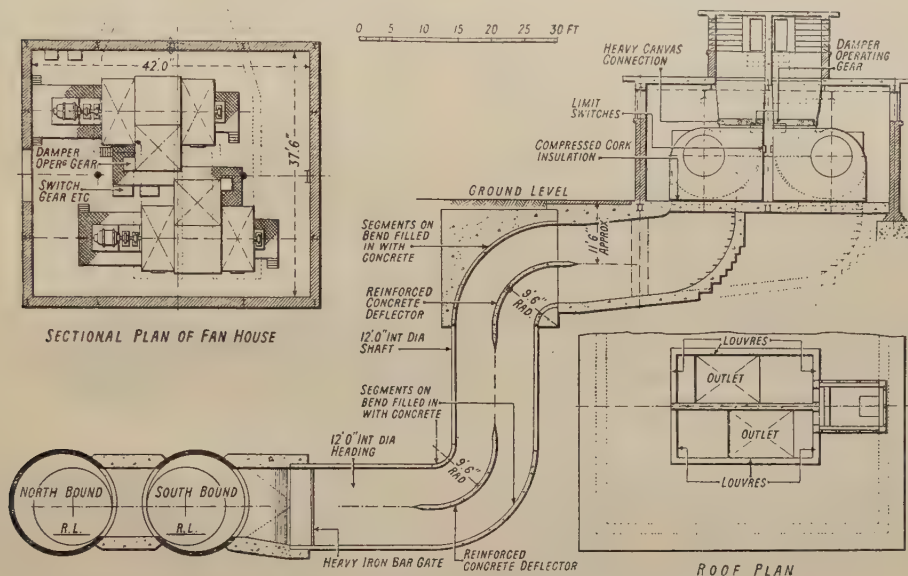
Typical arrangement of extraction fan house, being that at Colina Road.
